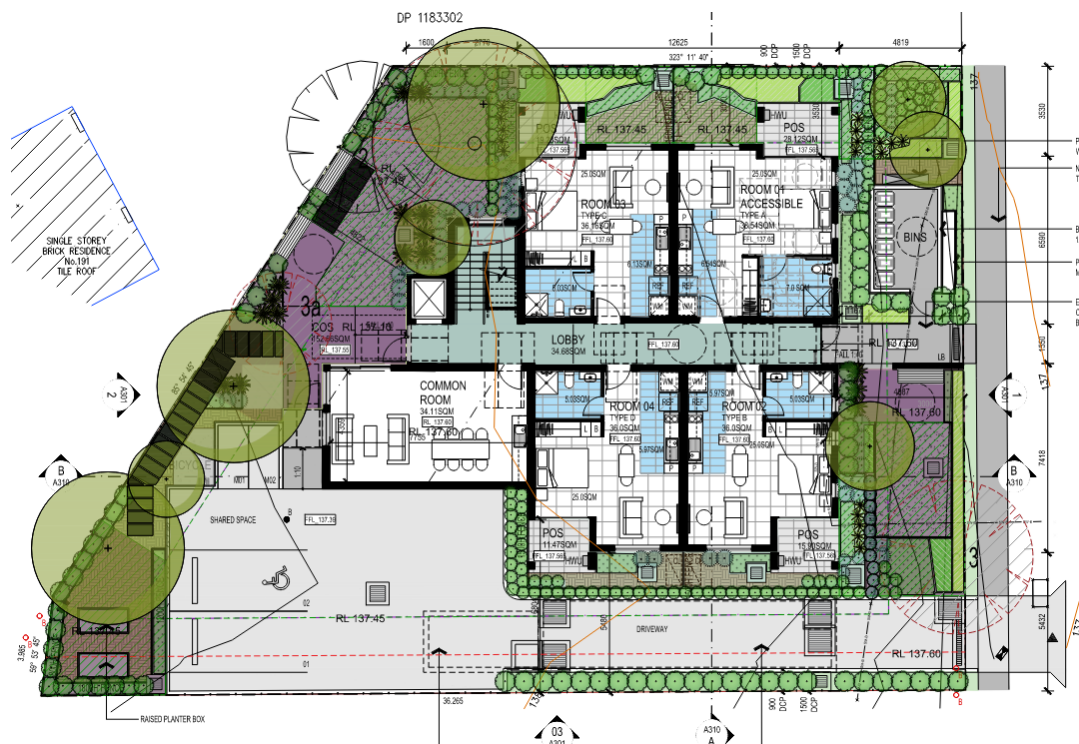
Extract from Architectural Plans – Ground Floor Plan (Source: Crawford Architects)
